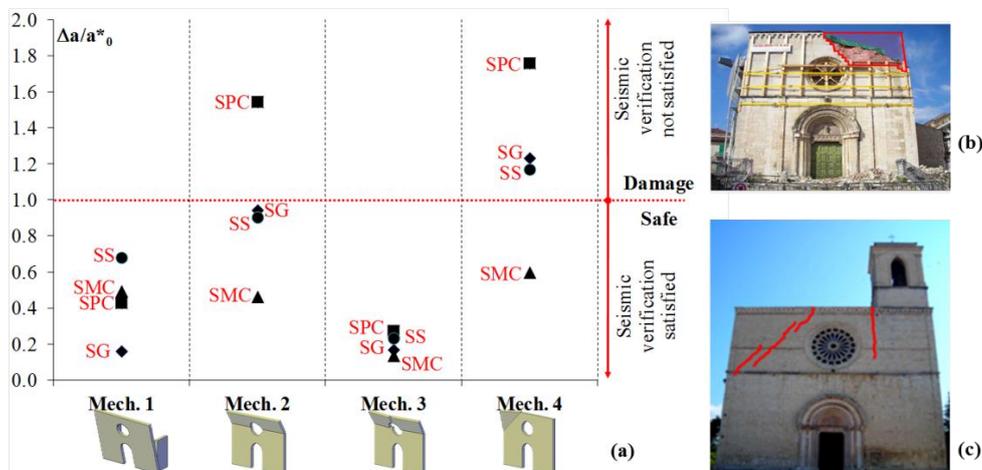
(a) Out-of-plane collapse of façades (b) San Pietro a Coppito church (SPC) and (c) San Silvestro church (SS)
